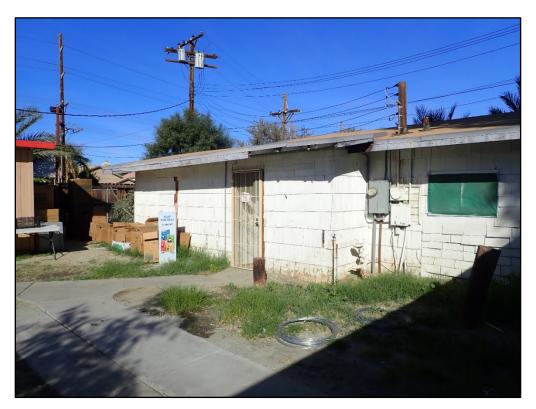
Southwest façade/entrance of Building 2, facing north.
